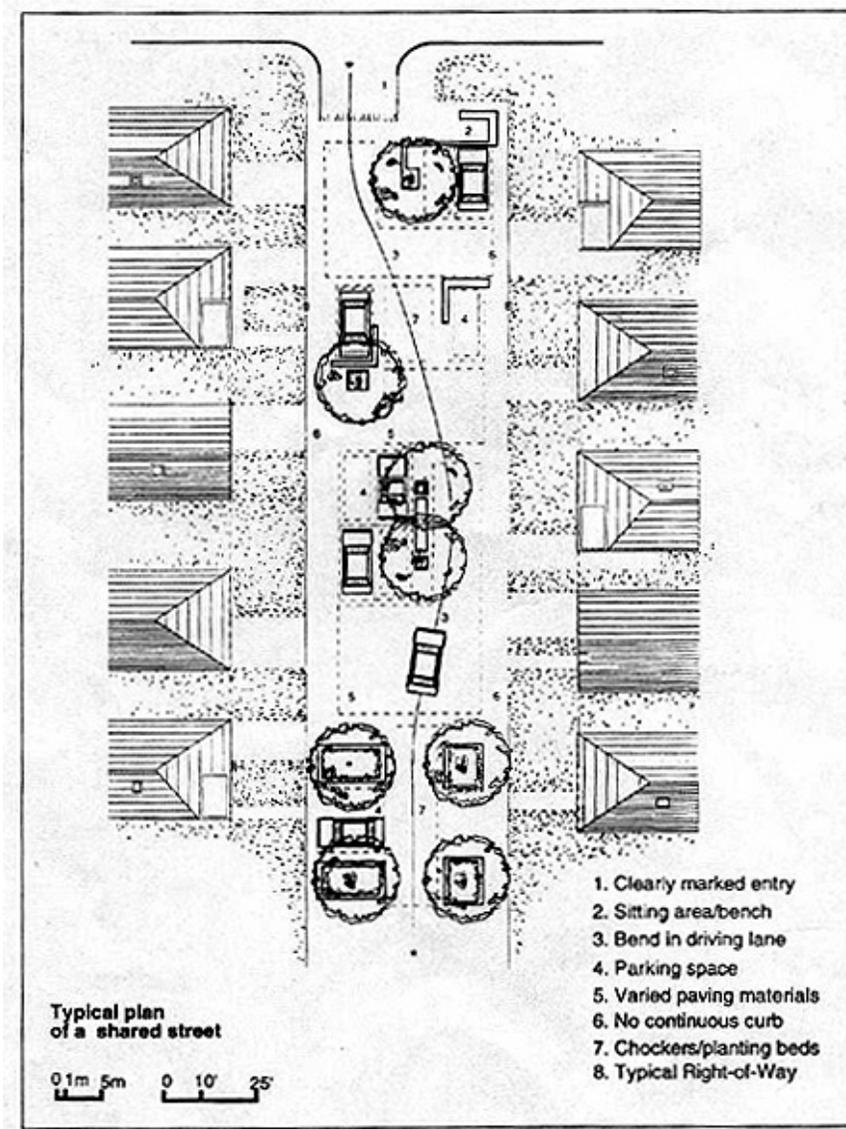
Typical plan of a shared street (*woonerf*). Note that, a clearly marked entrance, and a bend in driving lane is common. (Southworth, 1997: 110)
